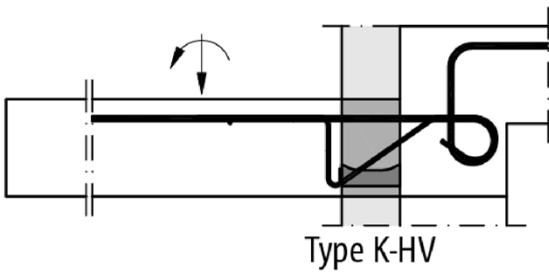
Schöck Isokorb® Type K-HV for freely cantilevered balconies with height offset downwards or wall connection
